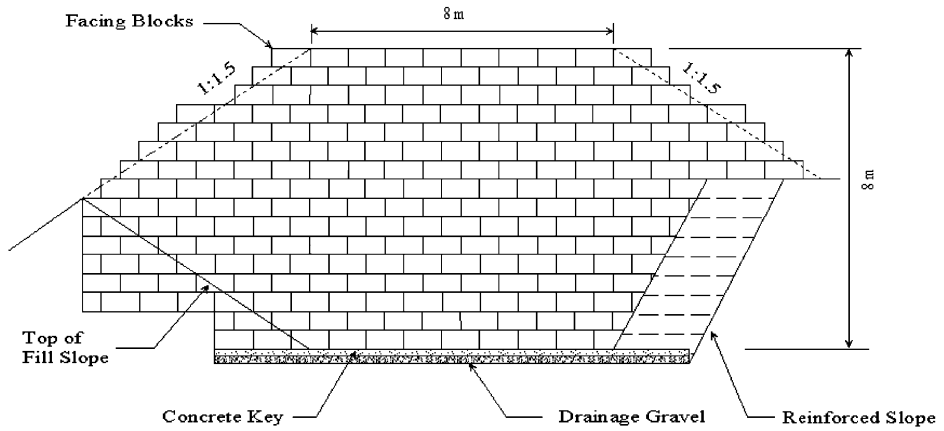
Front elevation of wall (adapted from PWRI 1997).
